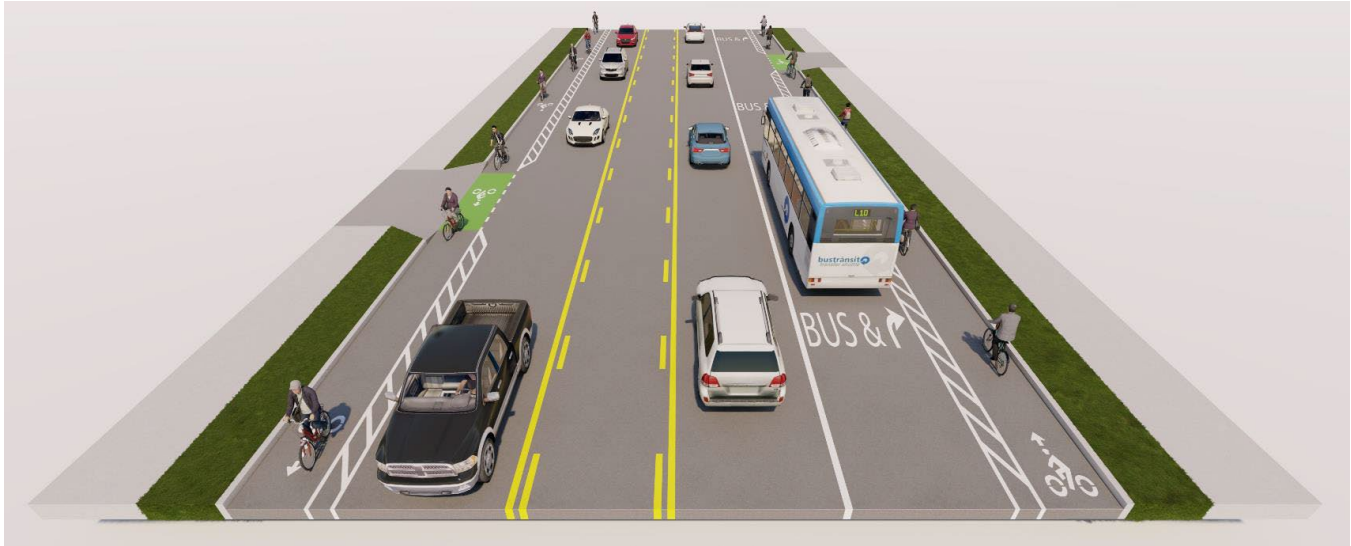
Alternative 1 – Falk Road to Stapleton Road
